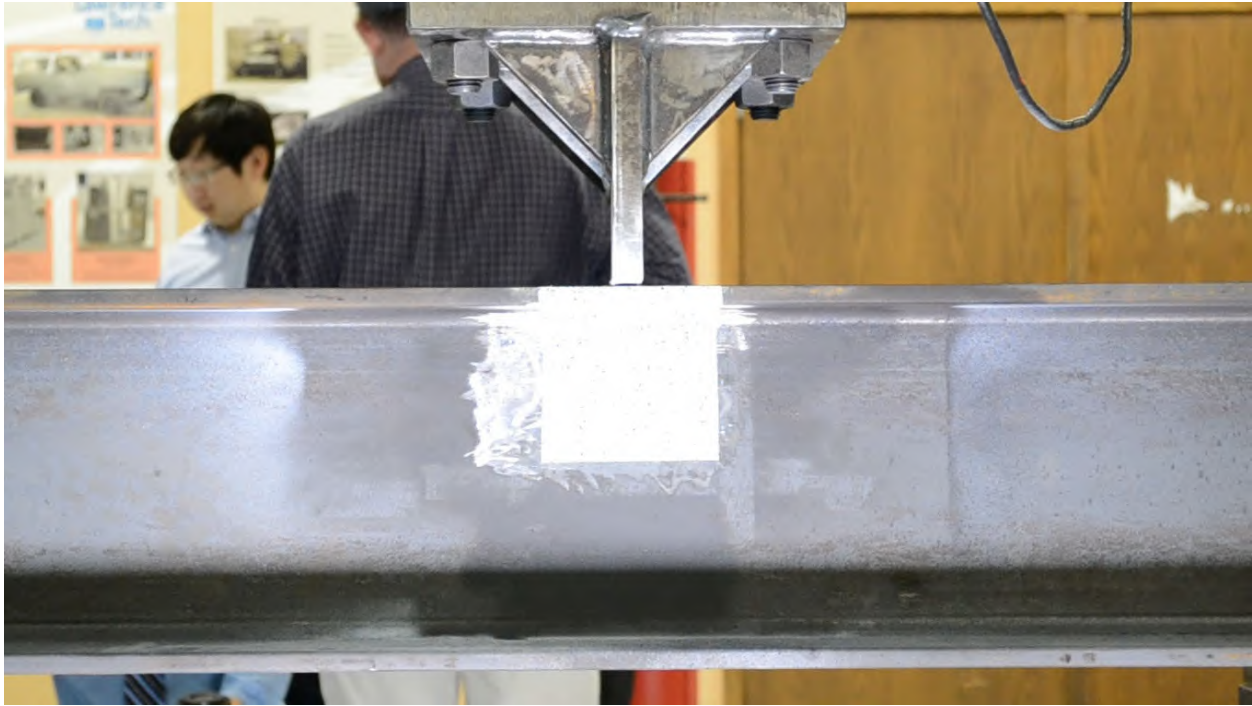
Close-up view of backside W10X19-SC-E0 after testing
